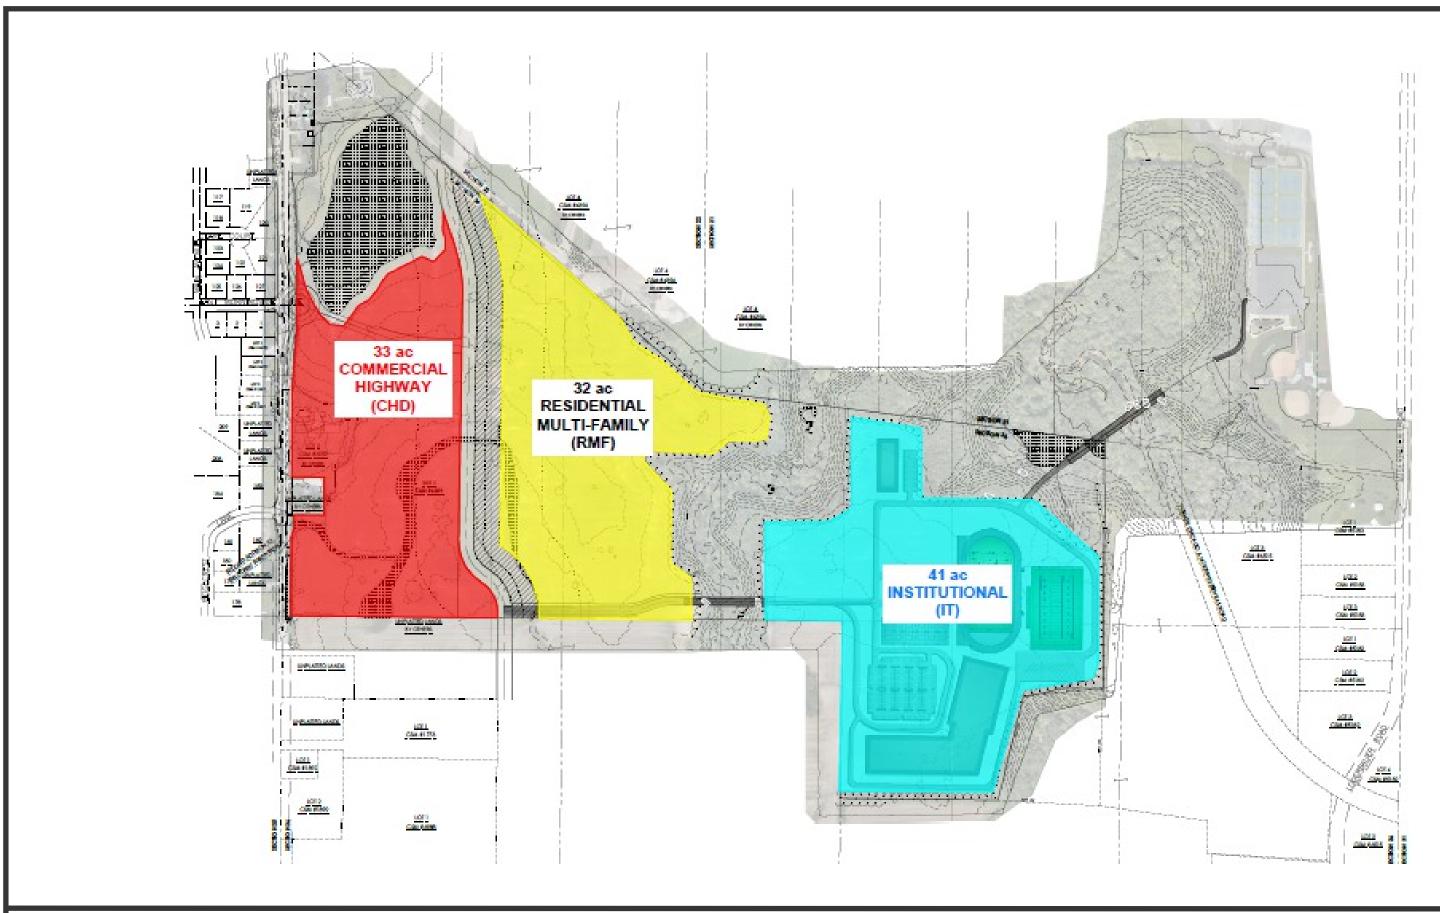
B CONCEPTUAL SITE PLAN OFF-SITE DEVELOPMENT AREA
